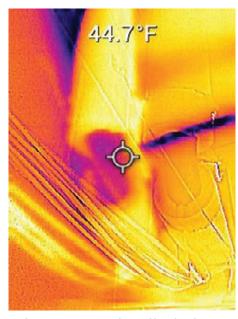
&8 Interior ceiling plenum at Classroom, north wall – leak area at rain leader has insulation removed. No heat trace.
